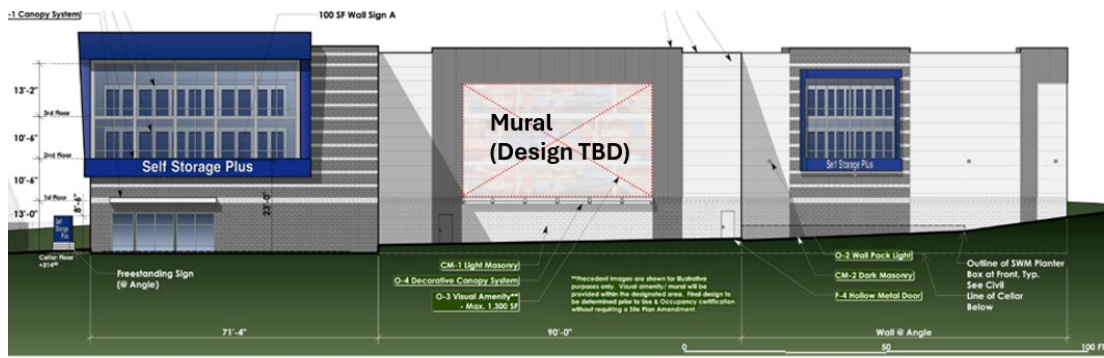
Northeast Building Elevation along Parklawn Drive)
